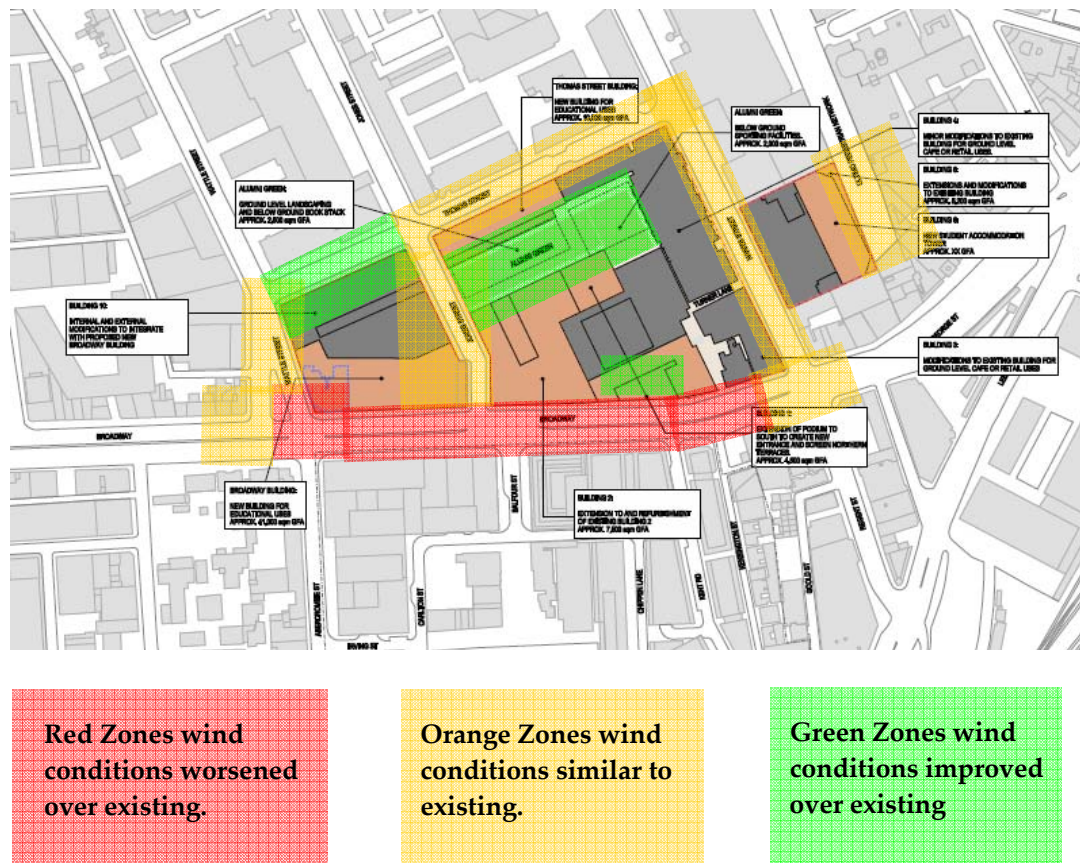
Wind Intensity Zoning Exterior Locations – Concept Plan UTS.
